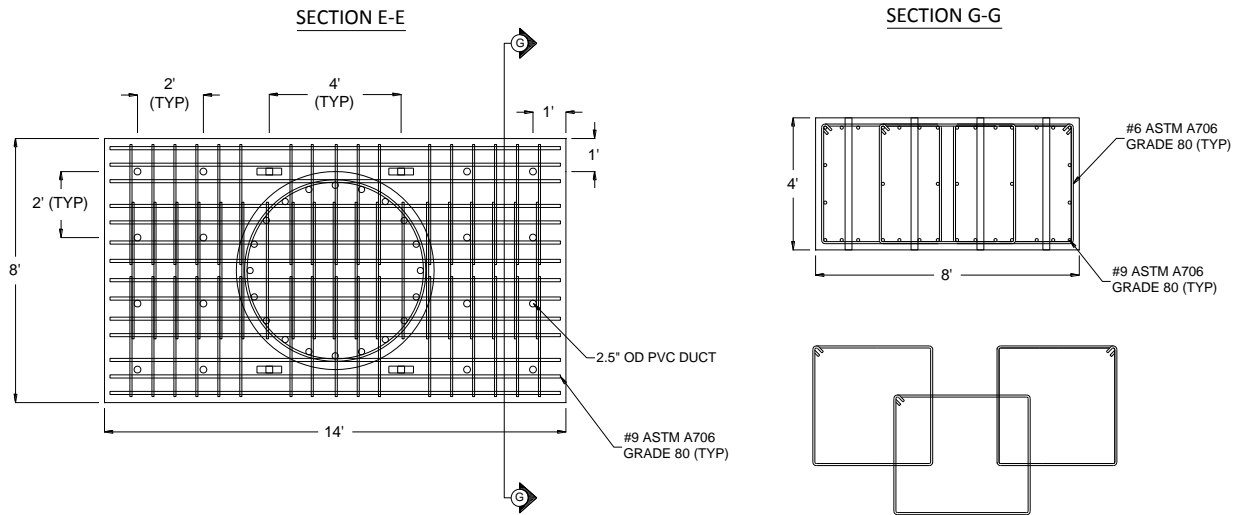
Cross section of footing (Lotfizadeh, 2019).
